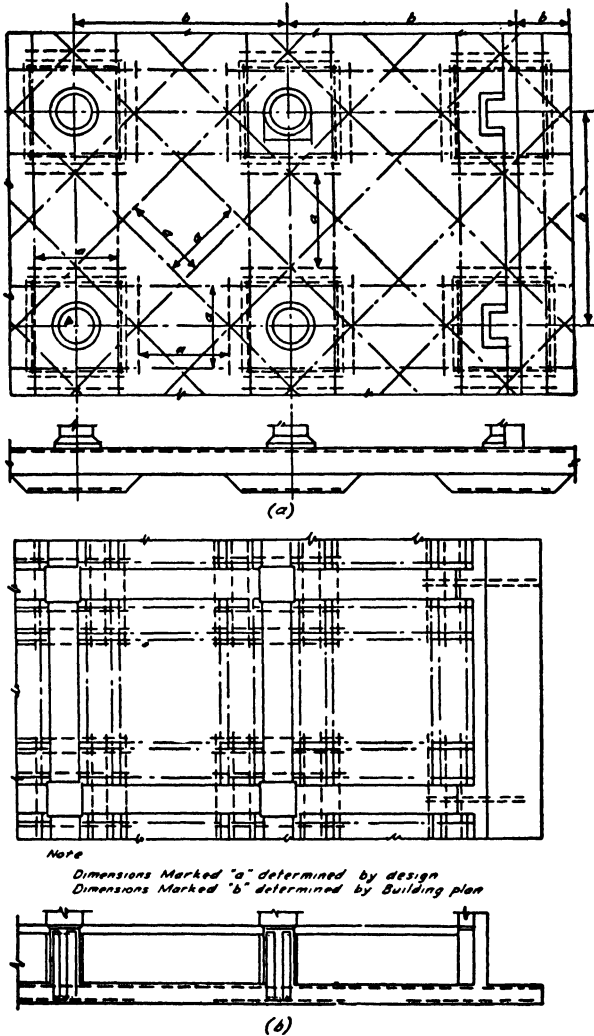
Raft Foundations. (a) flat slab; (b) beam and slab.
